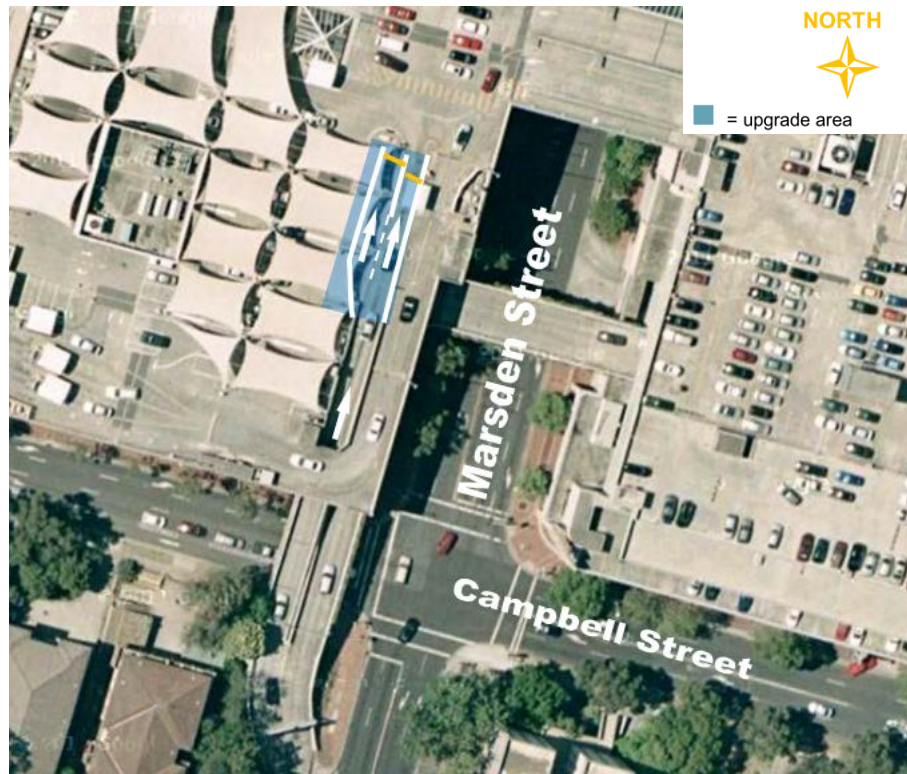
Proposed additional boom gate and lane on Marsden Street entry ramp
